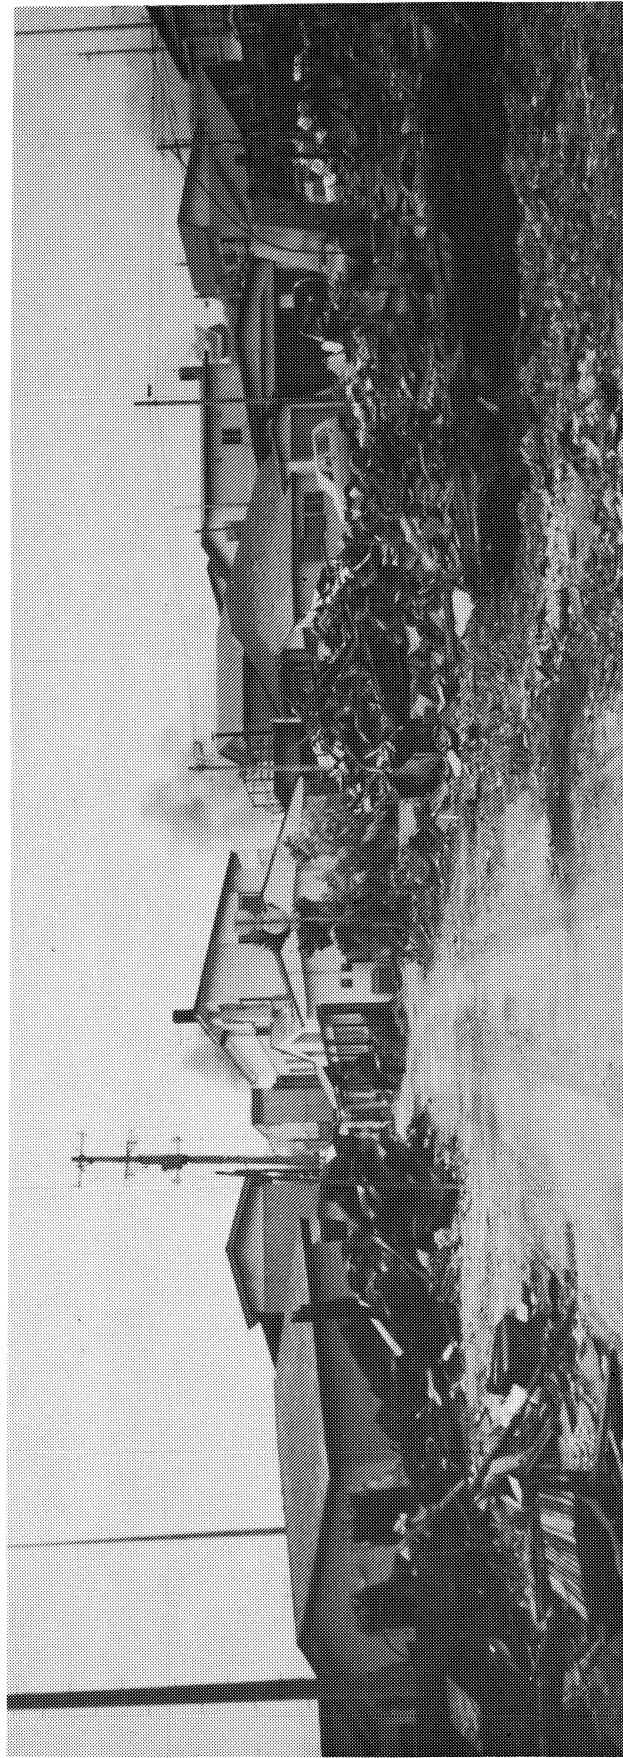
Damage to wood-frame buildings from tsunami run up in Aonae at the far edge of the heavily damaged area.
